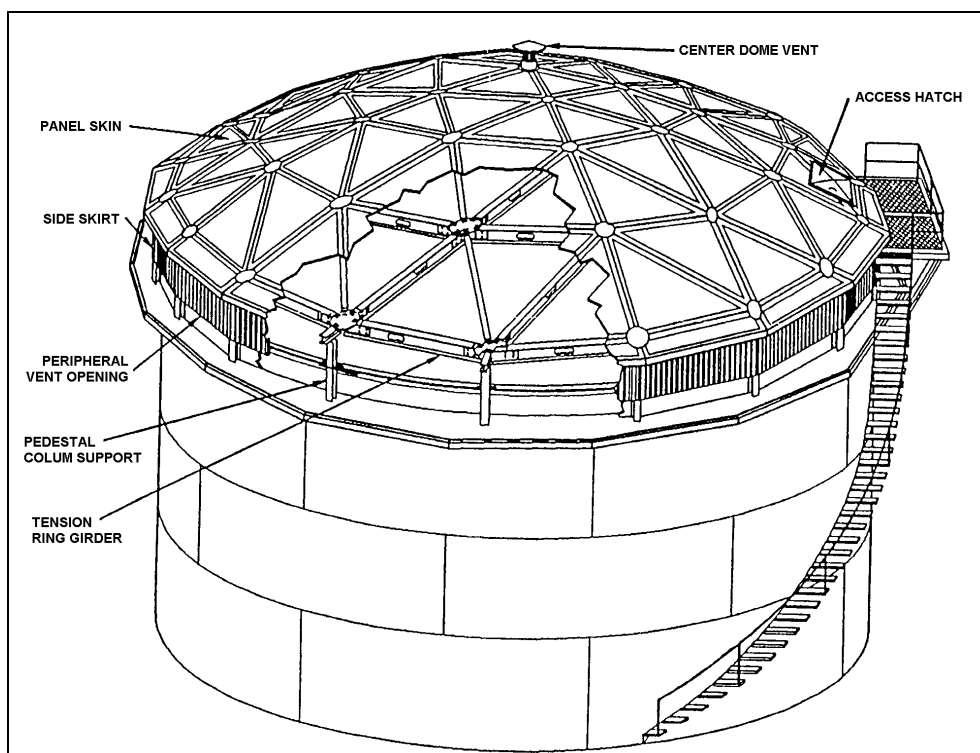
External floating roof tank equipped with a geodesic aluminium dome
